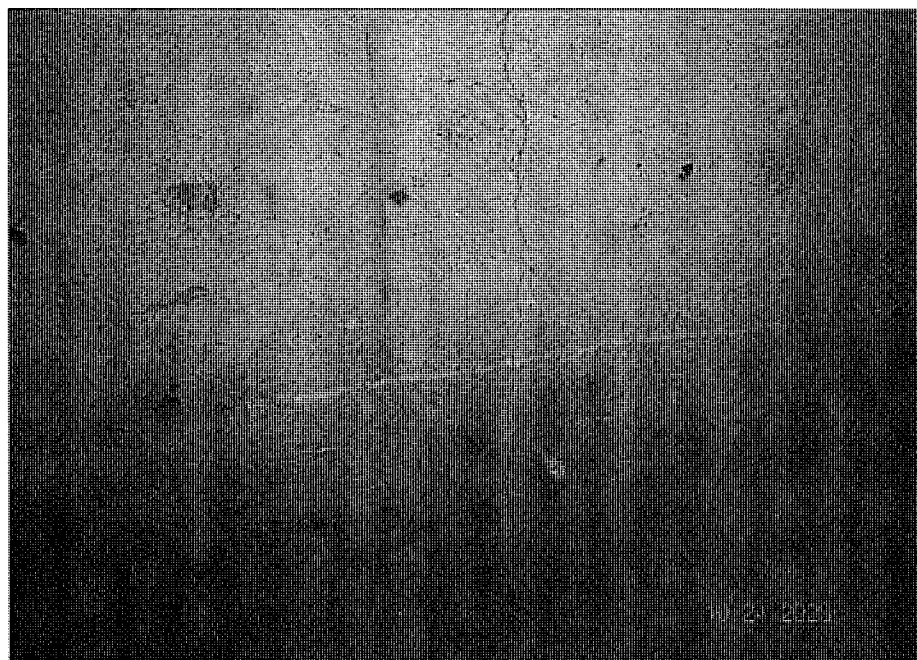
Representative vertical hairline crack in tunnel wall.
